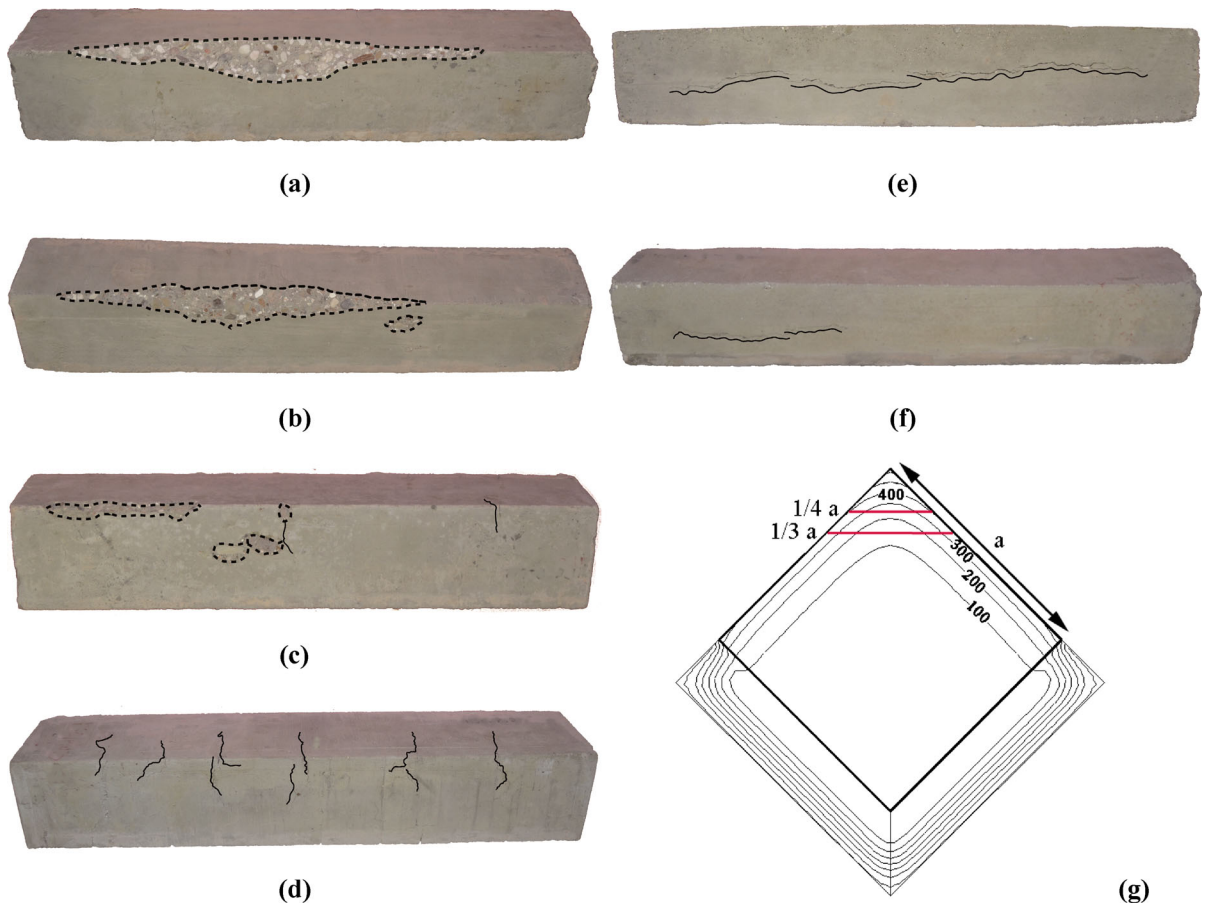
Typical damage in unreinforced (a, c, d) and reinforced specimens (b, e, f) from the highest to the lowest damage level: a medium spalling in Specimen NSC/P/W/1; b medium spalling in Specimen HPC/R/W/1; c light spalling with some indentation and scaling in Specimen HPC/P/W/2; d light corner cracking in
